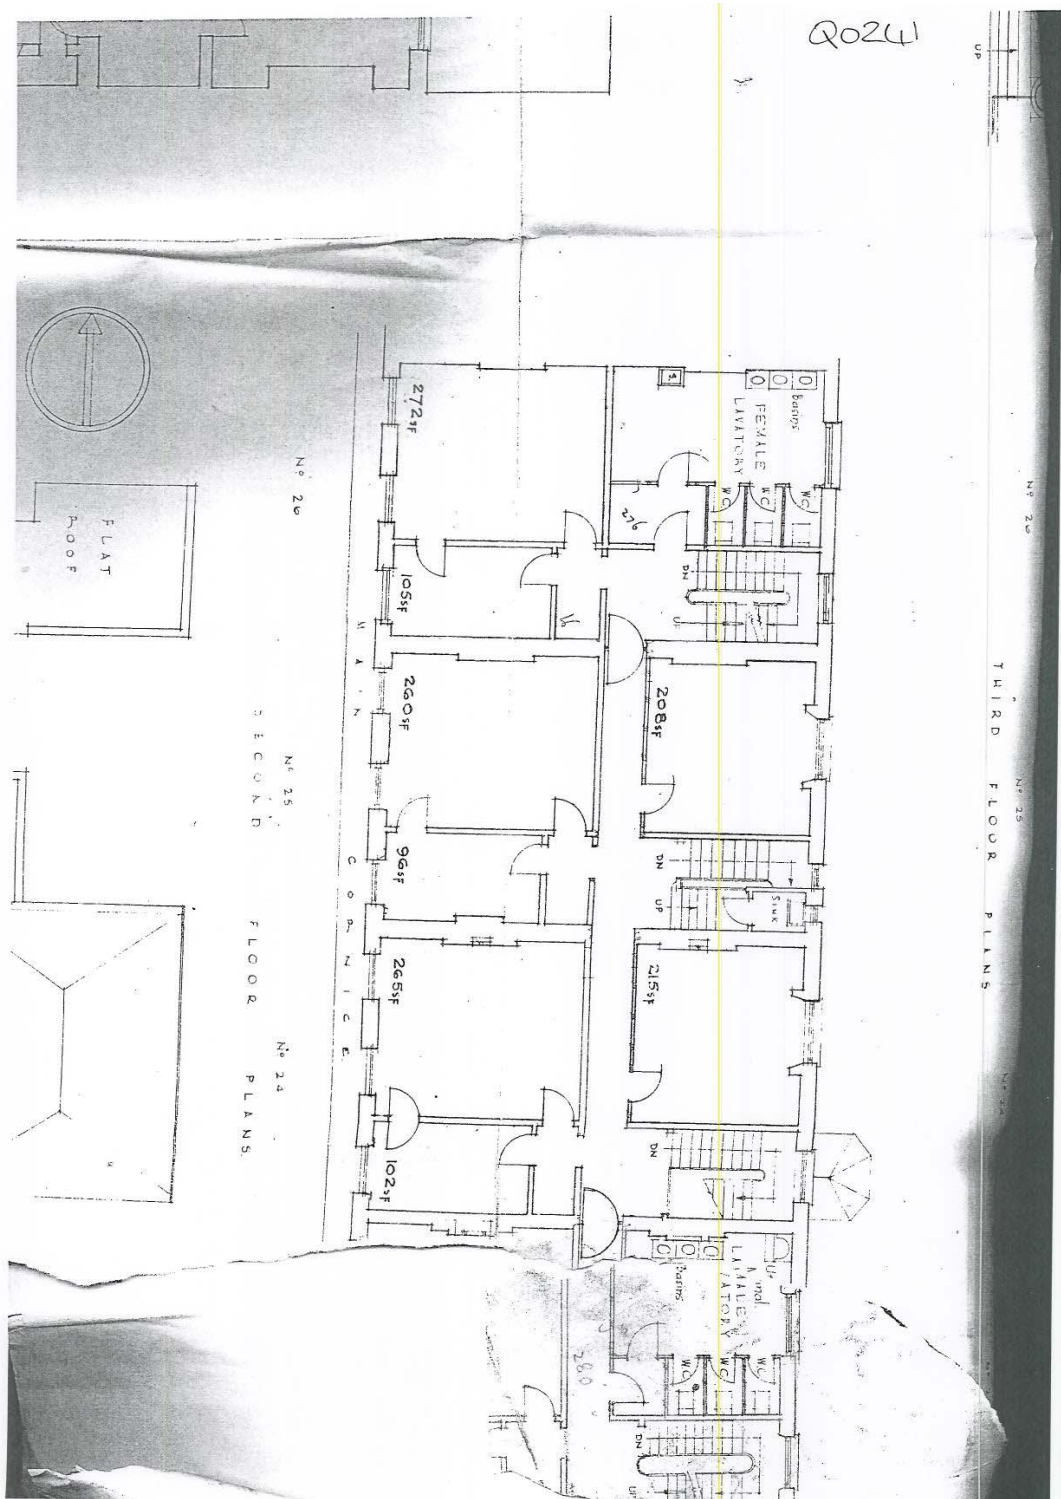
Extract from Ministry of Works Plans April 1946 Second Floor Plans Nos: 26 – 24 Chester Terrace – The Crown Estate Archives
